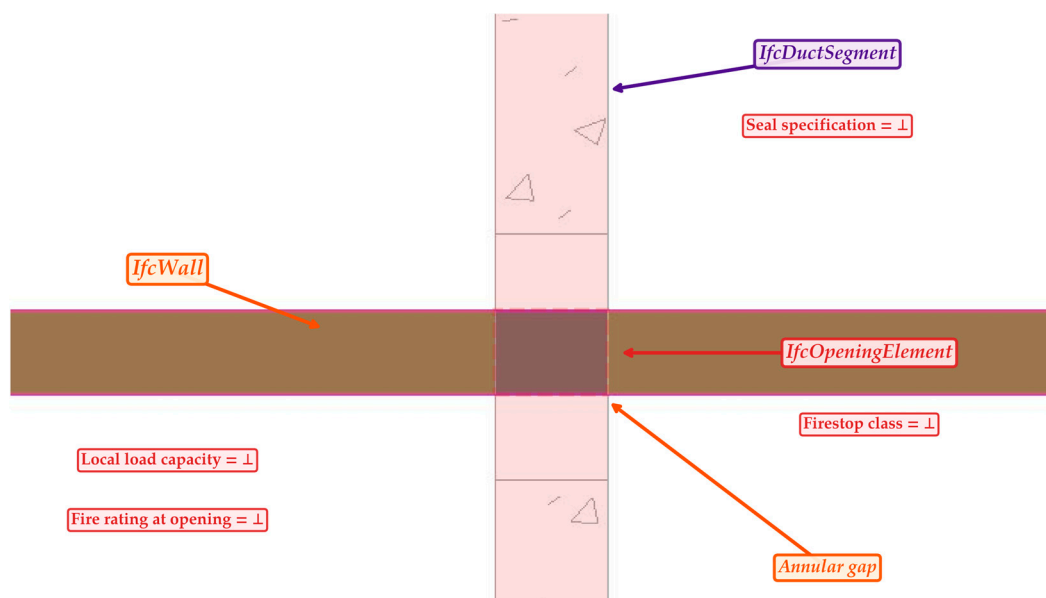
Cross-section of an MEP duct penetration through a fire-rated reinforced concrete wall, modeled in Autodesk Revit 2025. Source: own elaboration.
